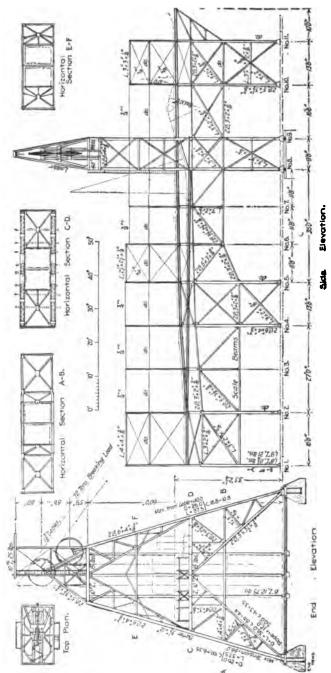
Detail Plans of the Cardiff Coal Tipple.
